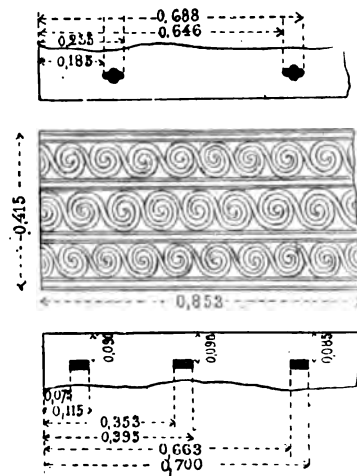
Tomb I. Fragment of decoration of façade. Elevation and Plan.
